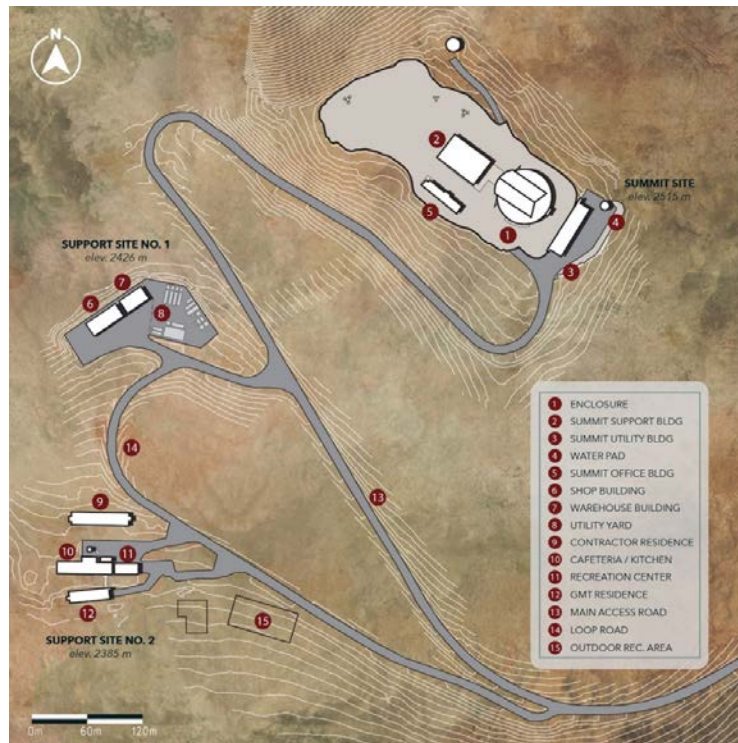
The GMT site master plan, showing the summit site; support site #1 dedicated to shop and warehouse buildings and the utility yard; and support site #2 providing construction residences, dining, and recreation facilities.
